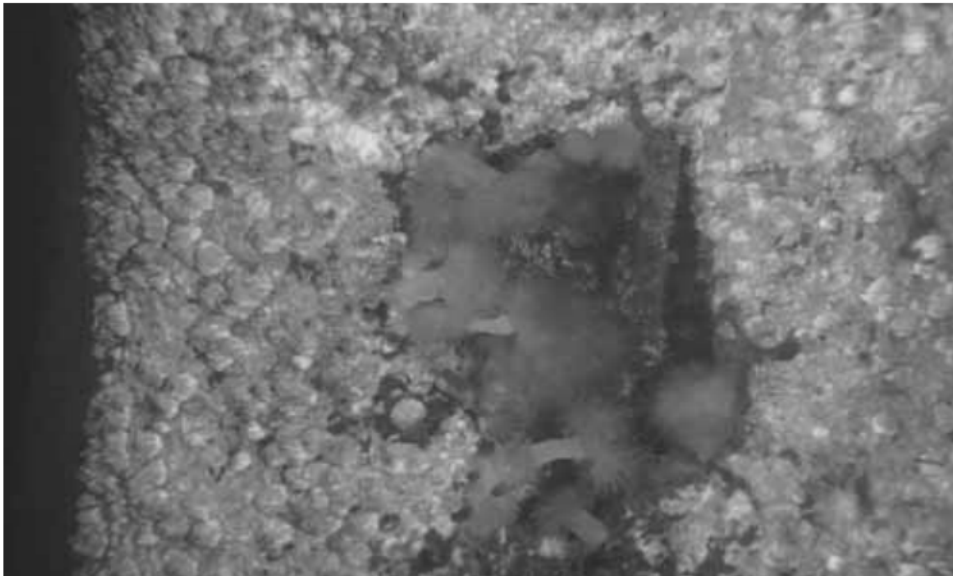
Canal Bridge No. 6880 - severe deterioration due to marine borer attack to a cross-brace on Pier No. 6.
